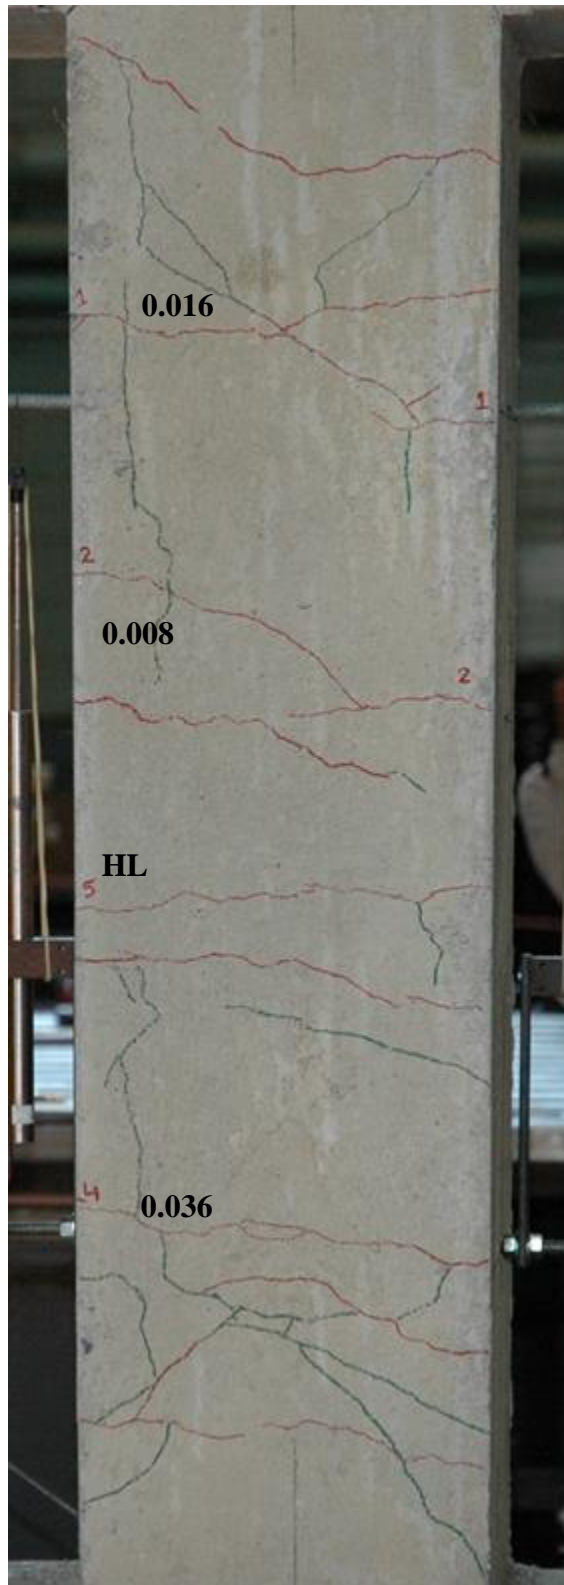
Cracks on west face of TS02 at Load Step 28
